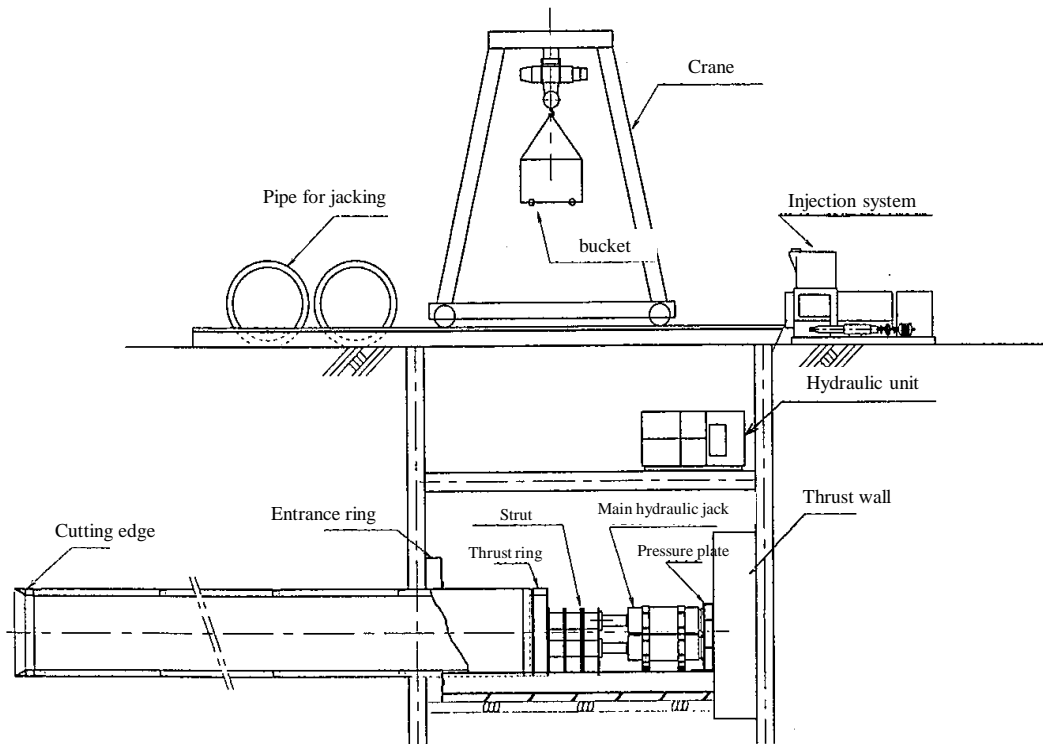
Overview of Cutting Edge Pipe Jacking Method
